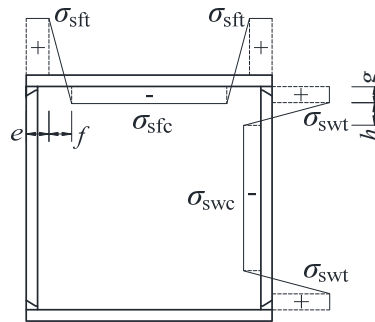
Residual stress pattern in welded stainless steel box sections
